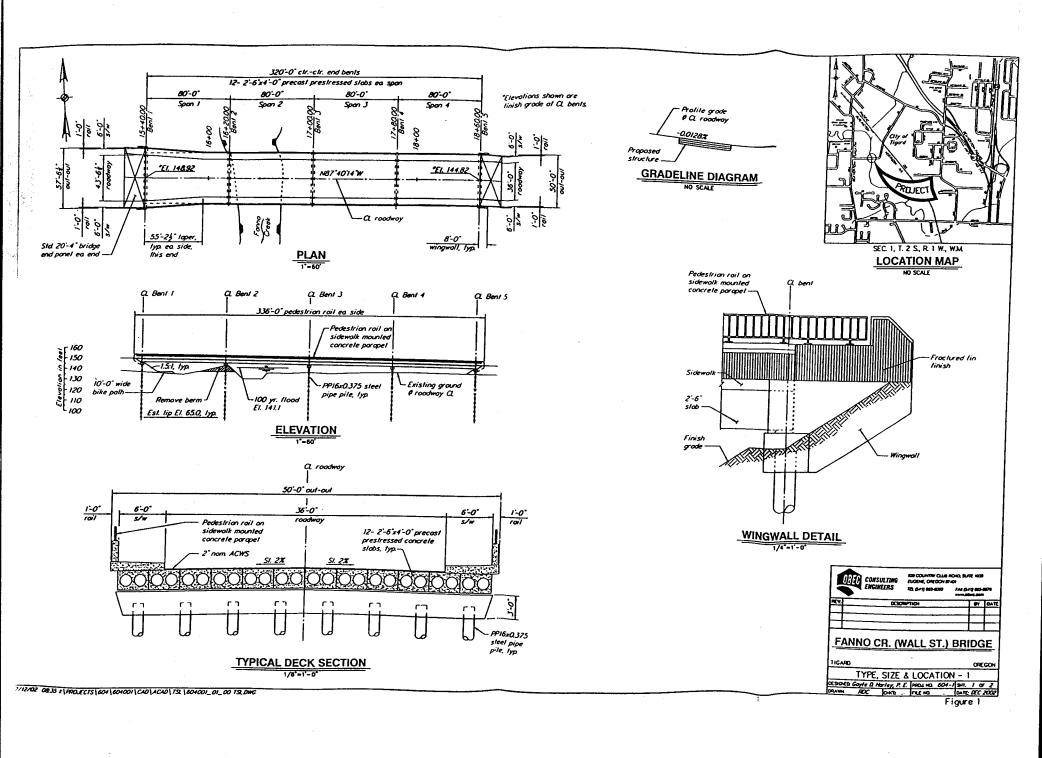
Fanno Creek (Wall Street) Bridge City of Tigard
